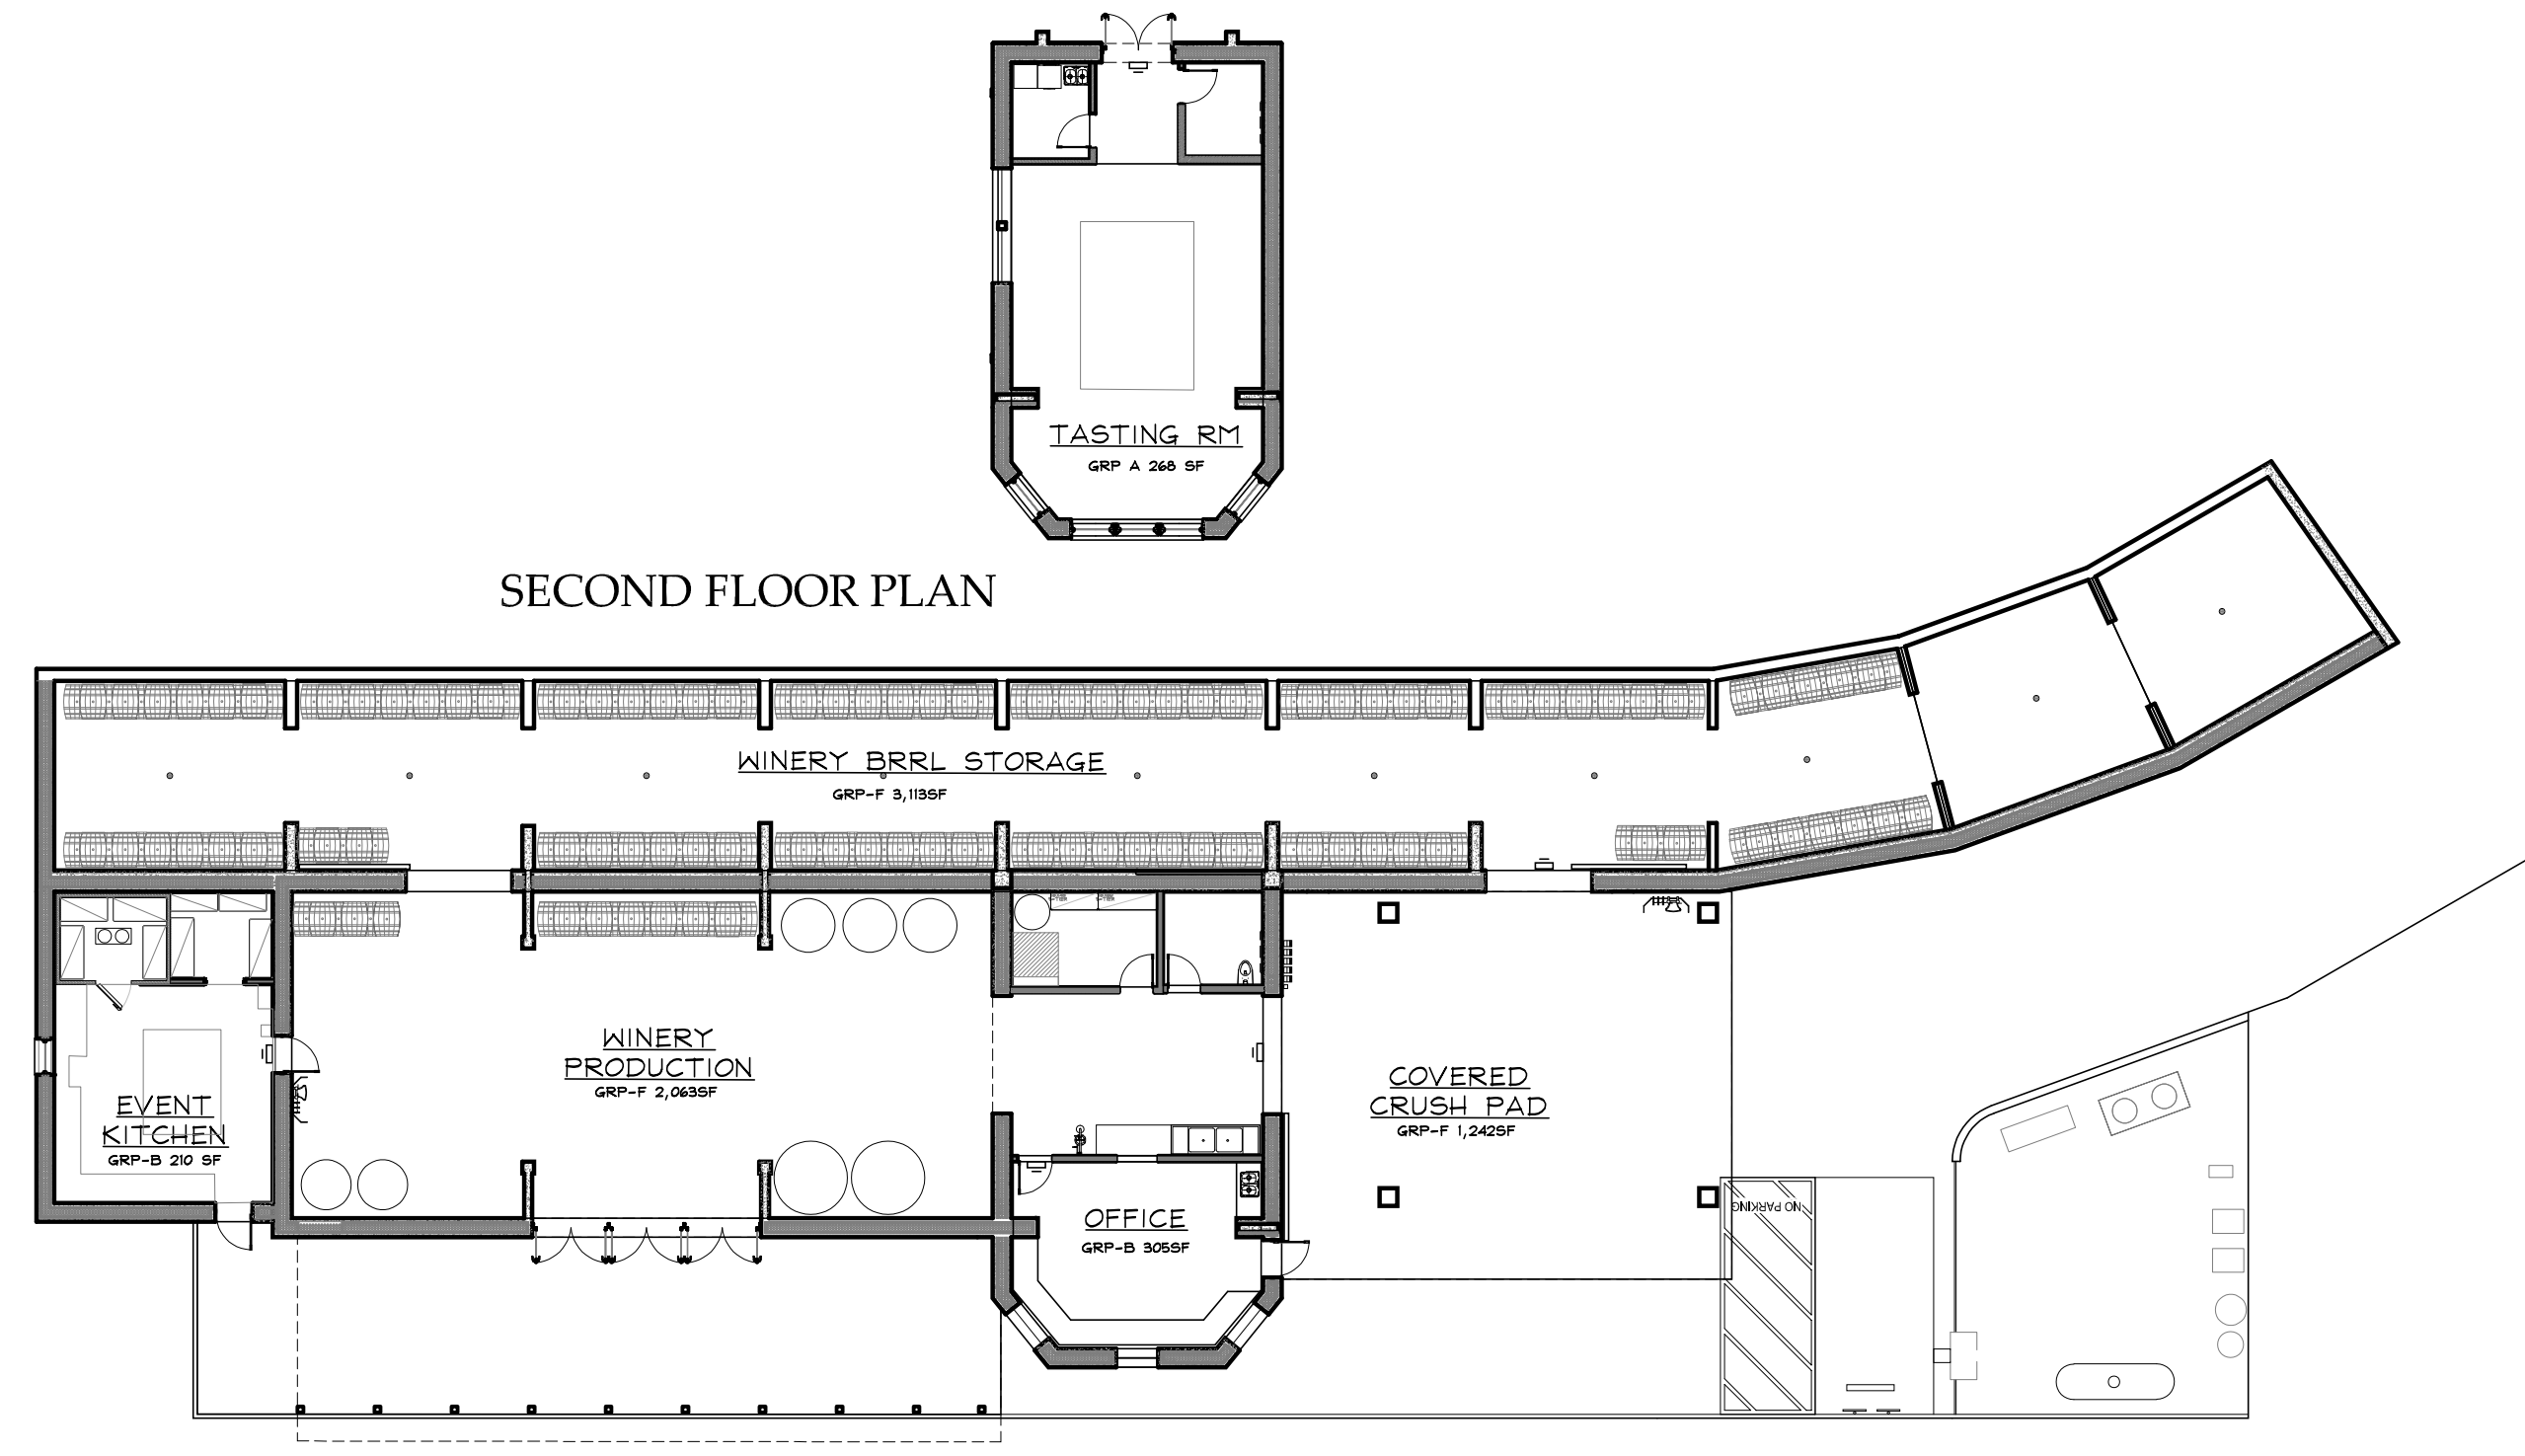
ENERGY MASS WALL PLAN SECTION
